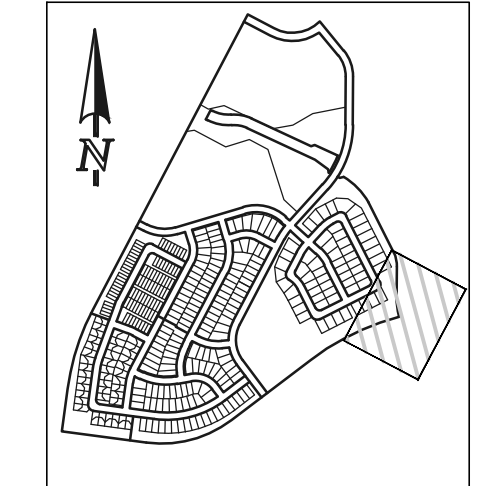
DETAIL: UTILITY SERVICE LOCATIONS FILINGS 50, 51, 52, 56
